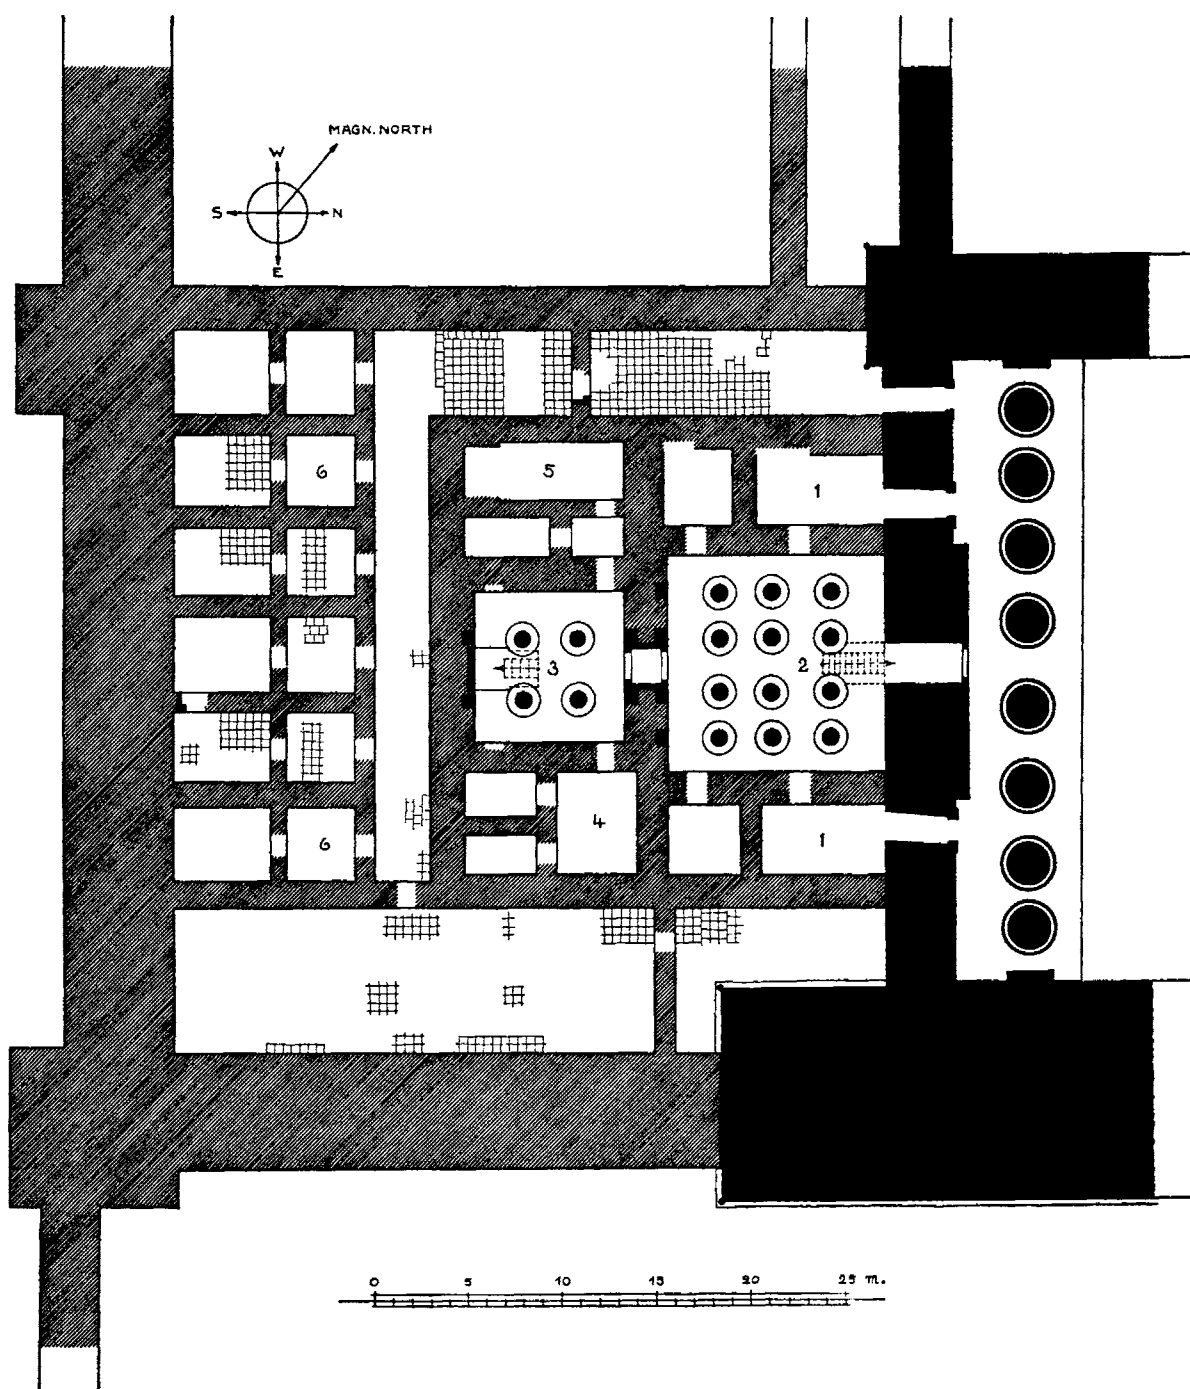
GROUND PLAN OF THE FIRST PALACE AT MEDINET HABU. SCALE, 1:400
